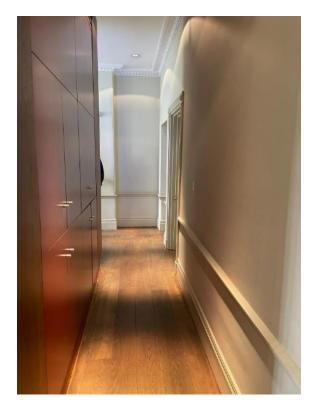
The back of the large central reception desk unit has created a narrow hallway between the existing west wall.
